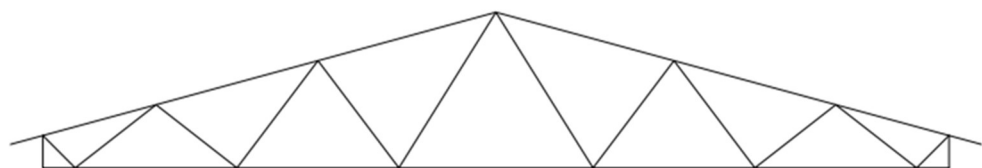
Roof truss designed for this building (Details of the drawing are mentioned in Appendix 1)
